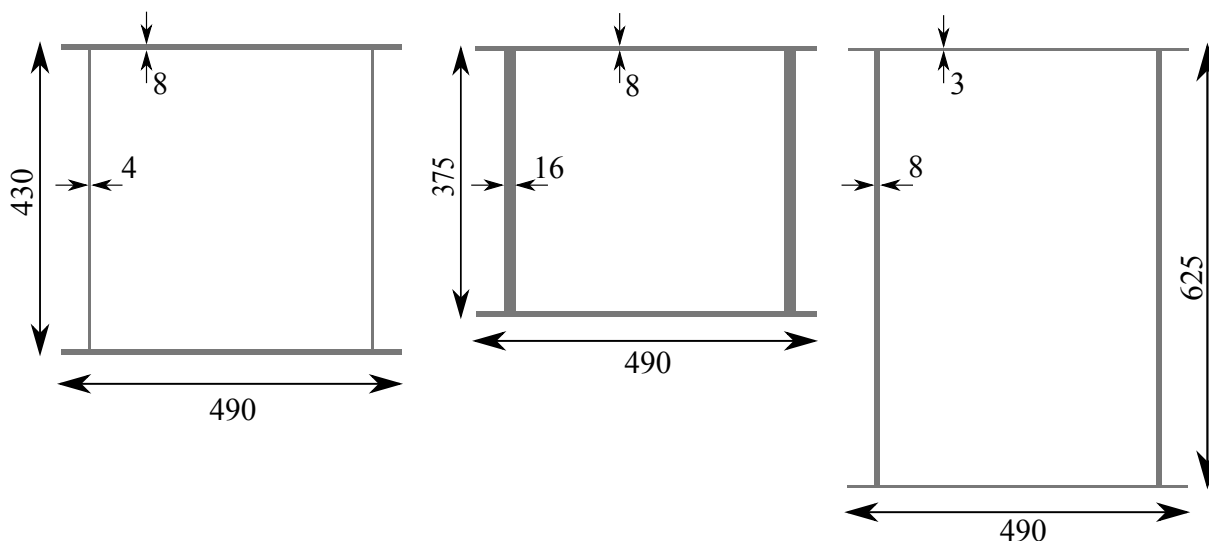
Steel boxes made of welded steel plates and 2.67 m long. From left to right: section A, B and C. Dimensions in mm.
